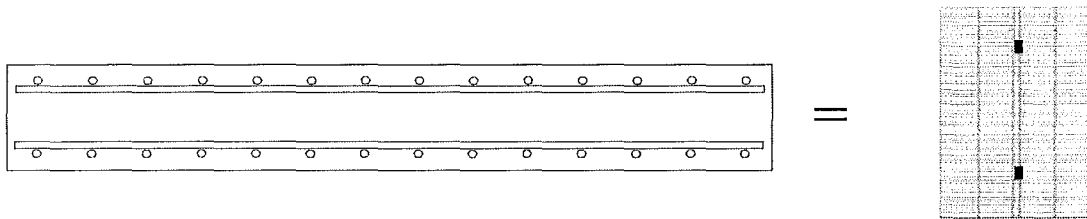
Structural model of wall section with two layers of reinforcing.
